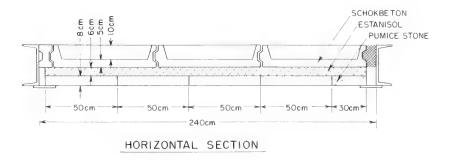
CONSTRUCTION DETAILS OF TEST PANEL NO.2
